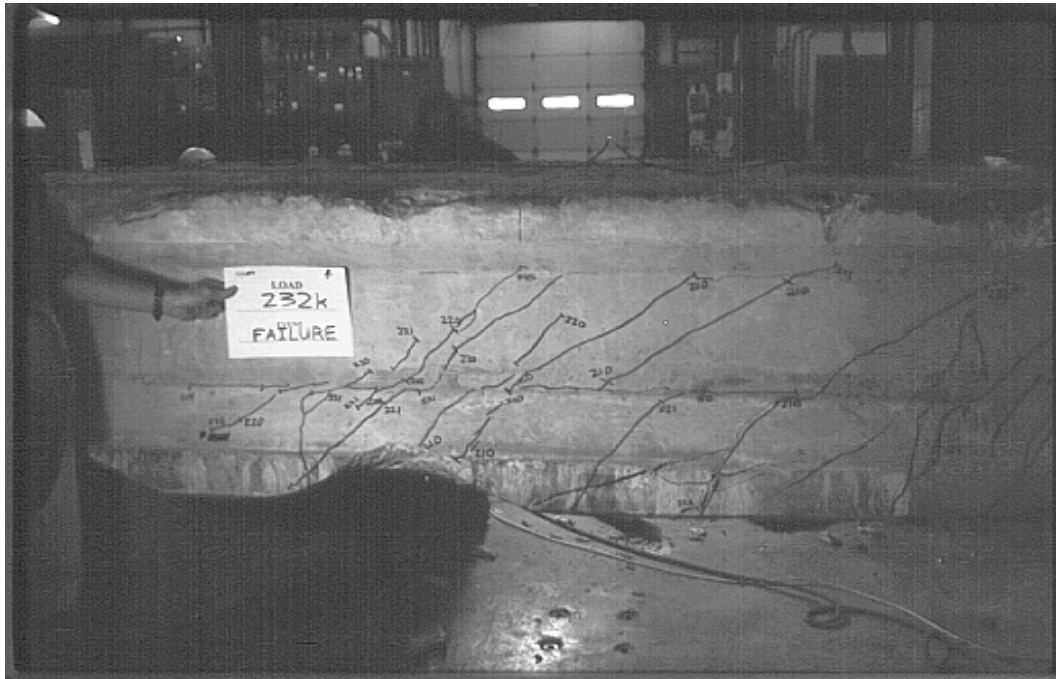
Cracking Pattern at Failure on East Face of Box Beam 5
